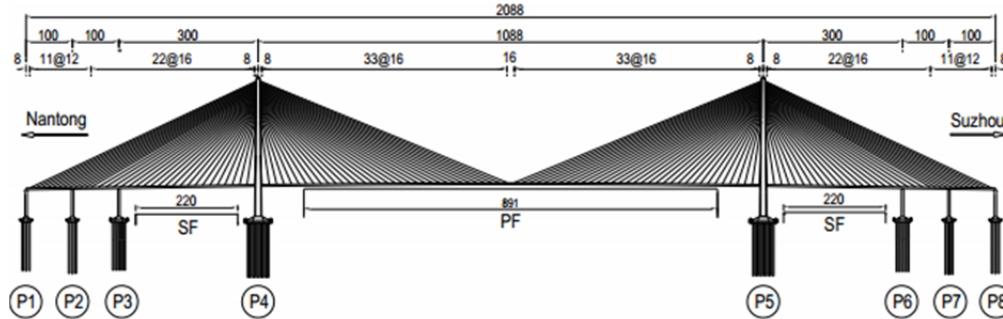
Span arrangement of Sutong Bridge (unit: m) [35]
